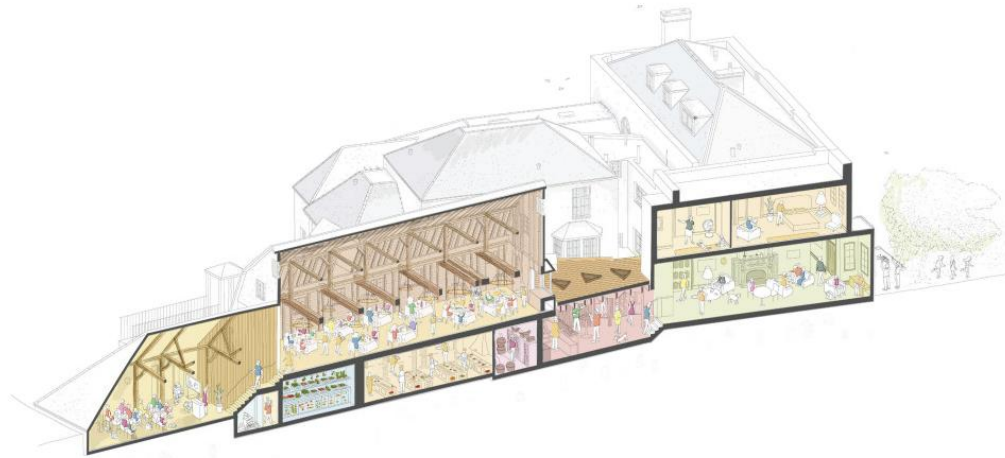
Proposed cutaway sketch showing how the proposed Manor House and barns are connected via the infill building.
